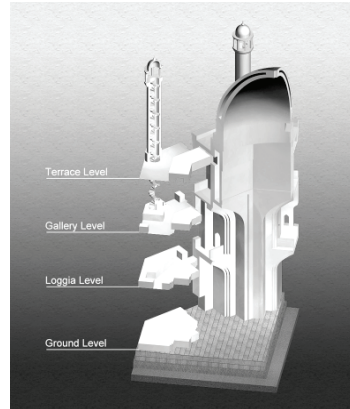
The structural load bearing system of the piers, drawing by author, 2016.
